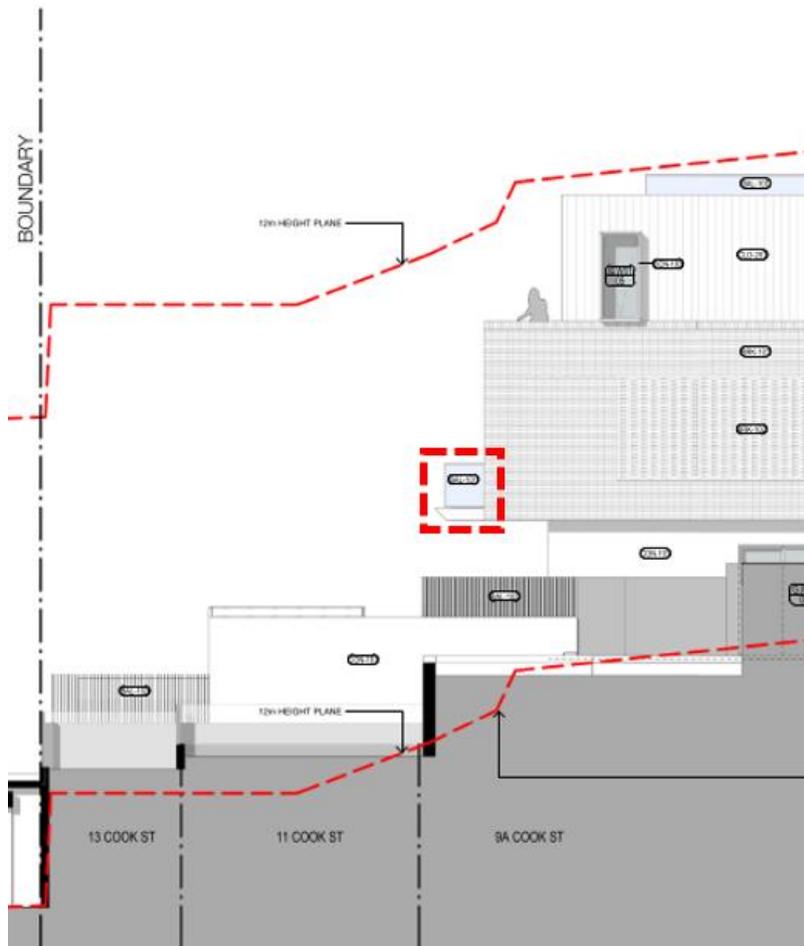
Proposed northern elevation of subject site. Balcony projection at level 1 to be removed is highlighted by dashed lines.
